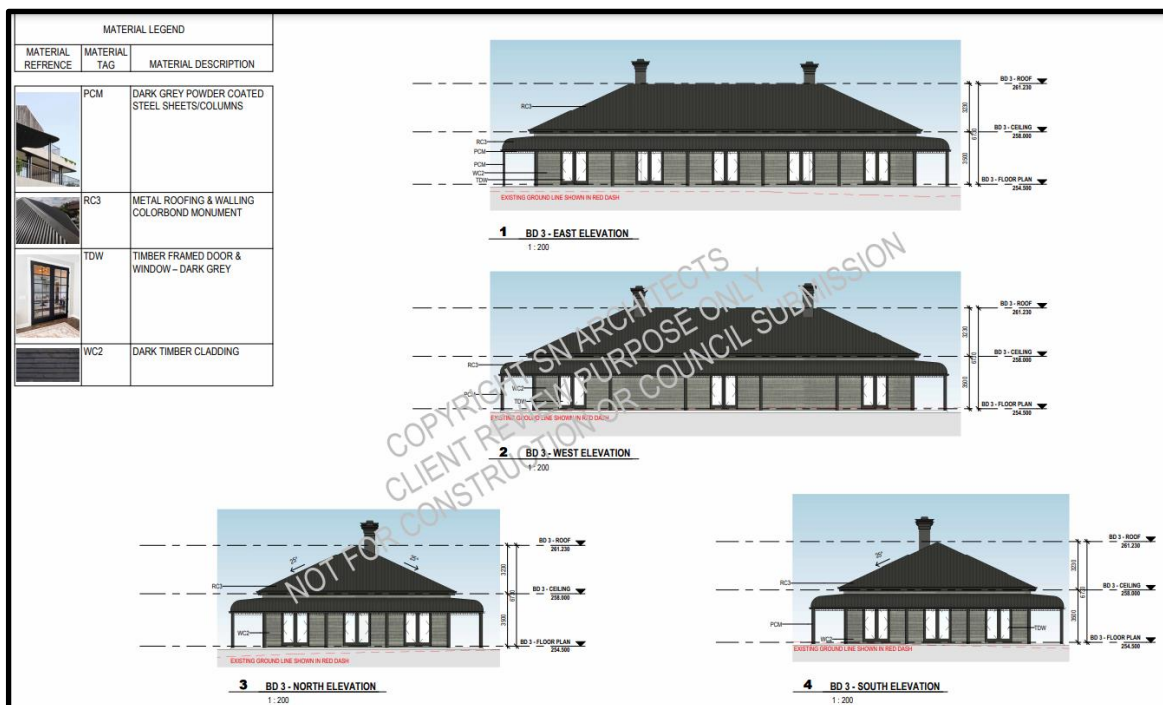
Restaurant Elevation Plan (Source: SN Architects)
